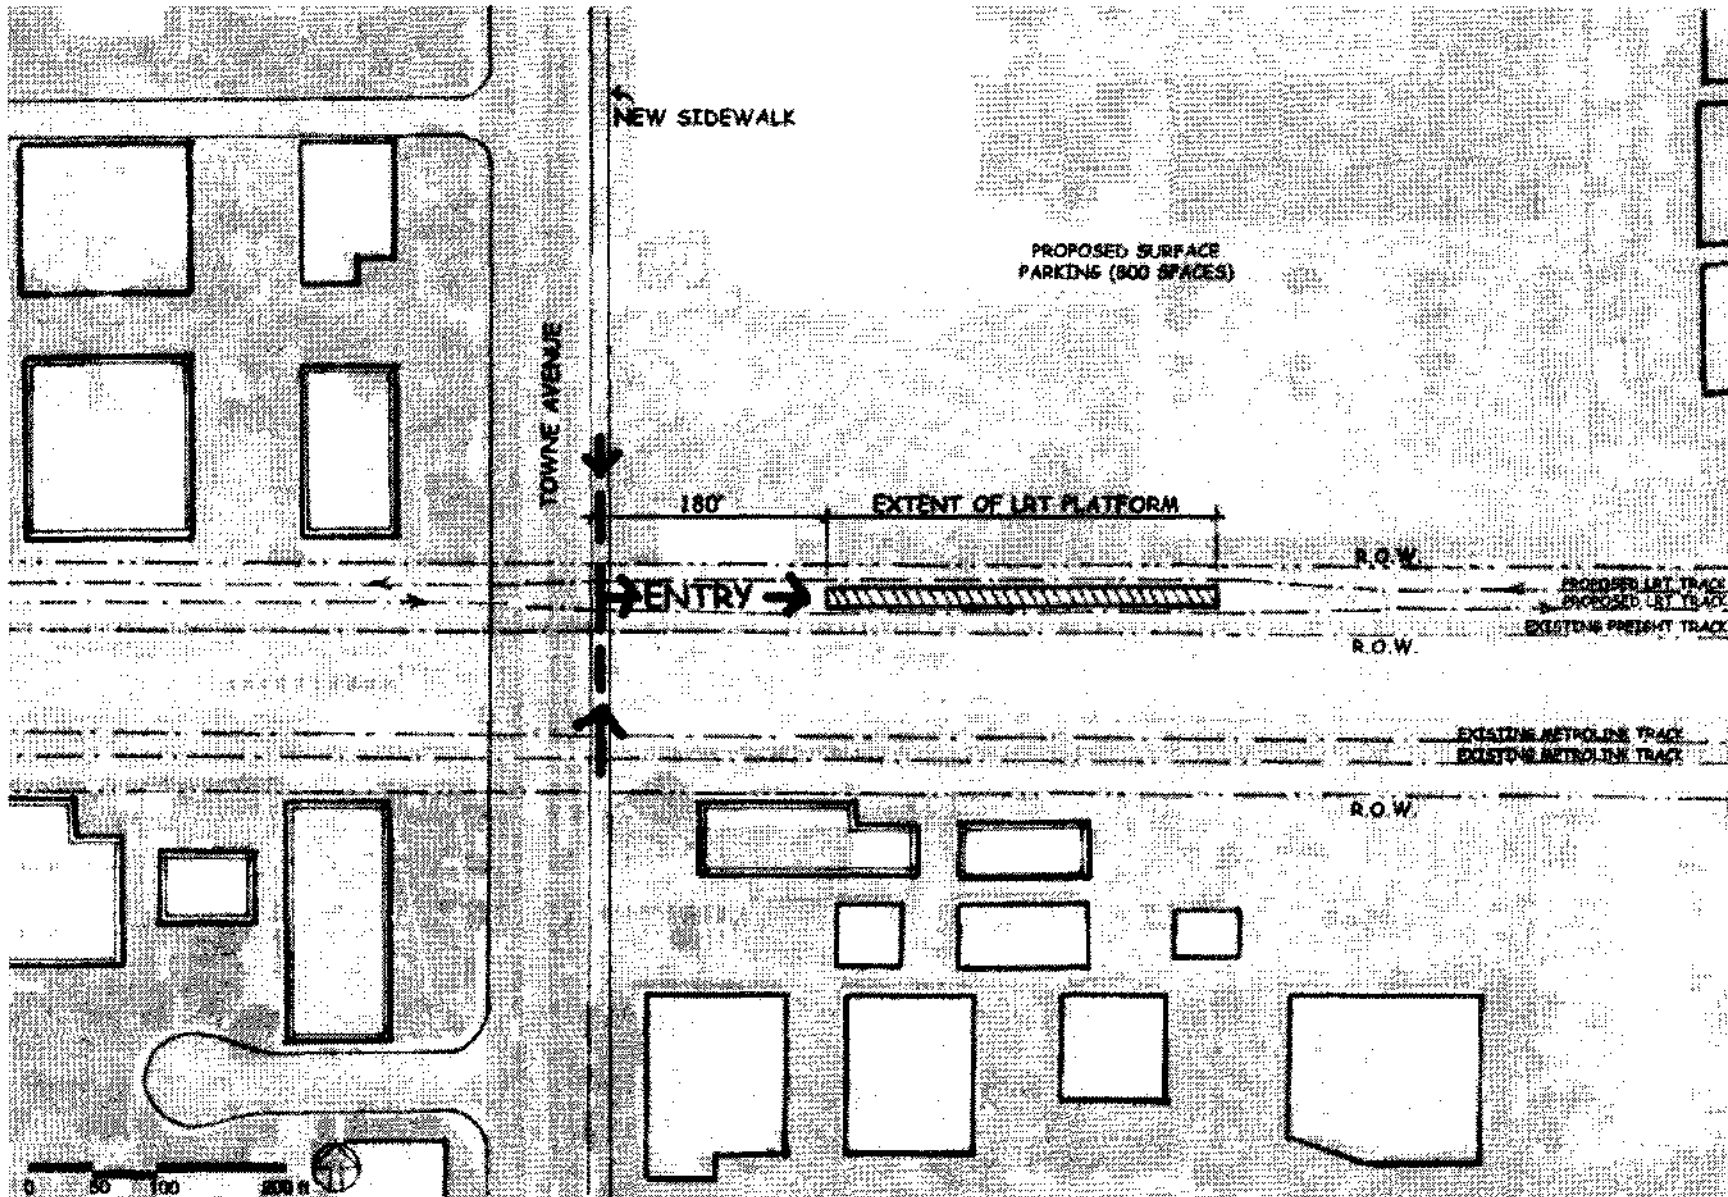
Site Plan: City of Pomona, Towne Avenue Station Option D
